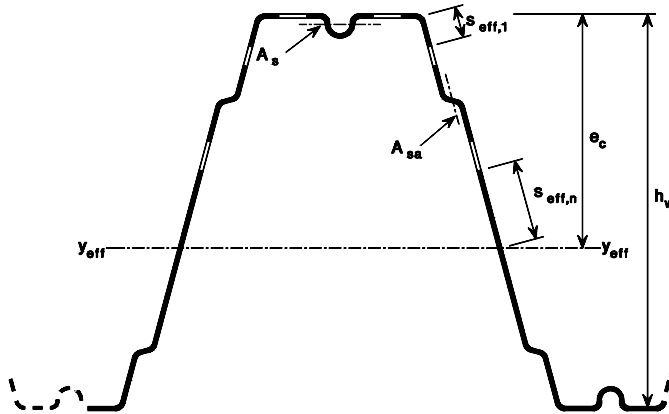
Trapezoidal profiled sheeting with flange stiffeners and web stiffeners
